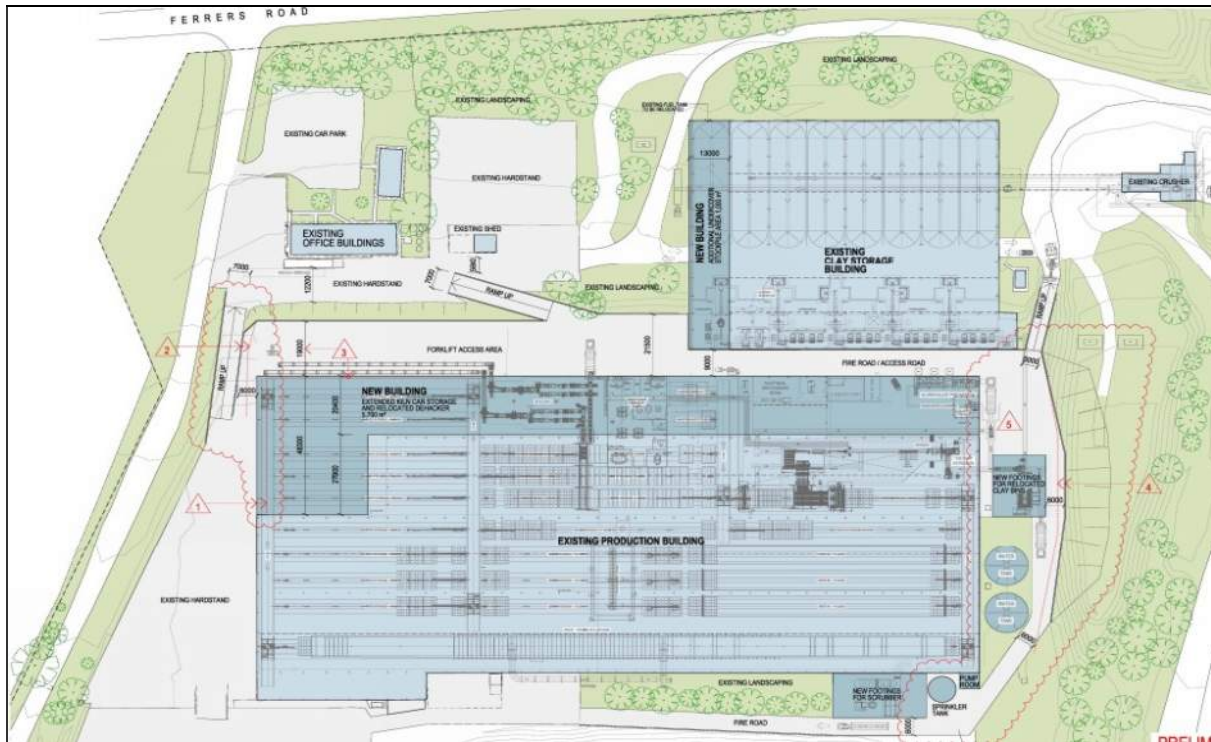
Proposed Preliminary Site Plan (SBA, 2018)
